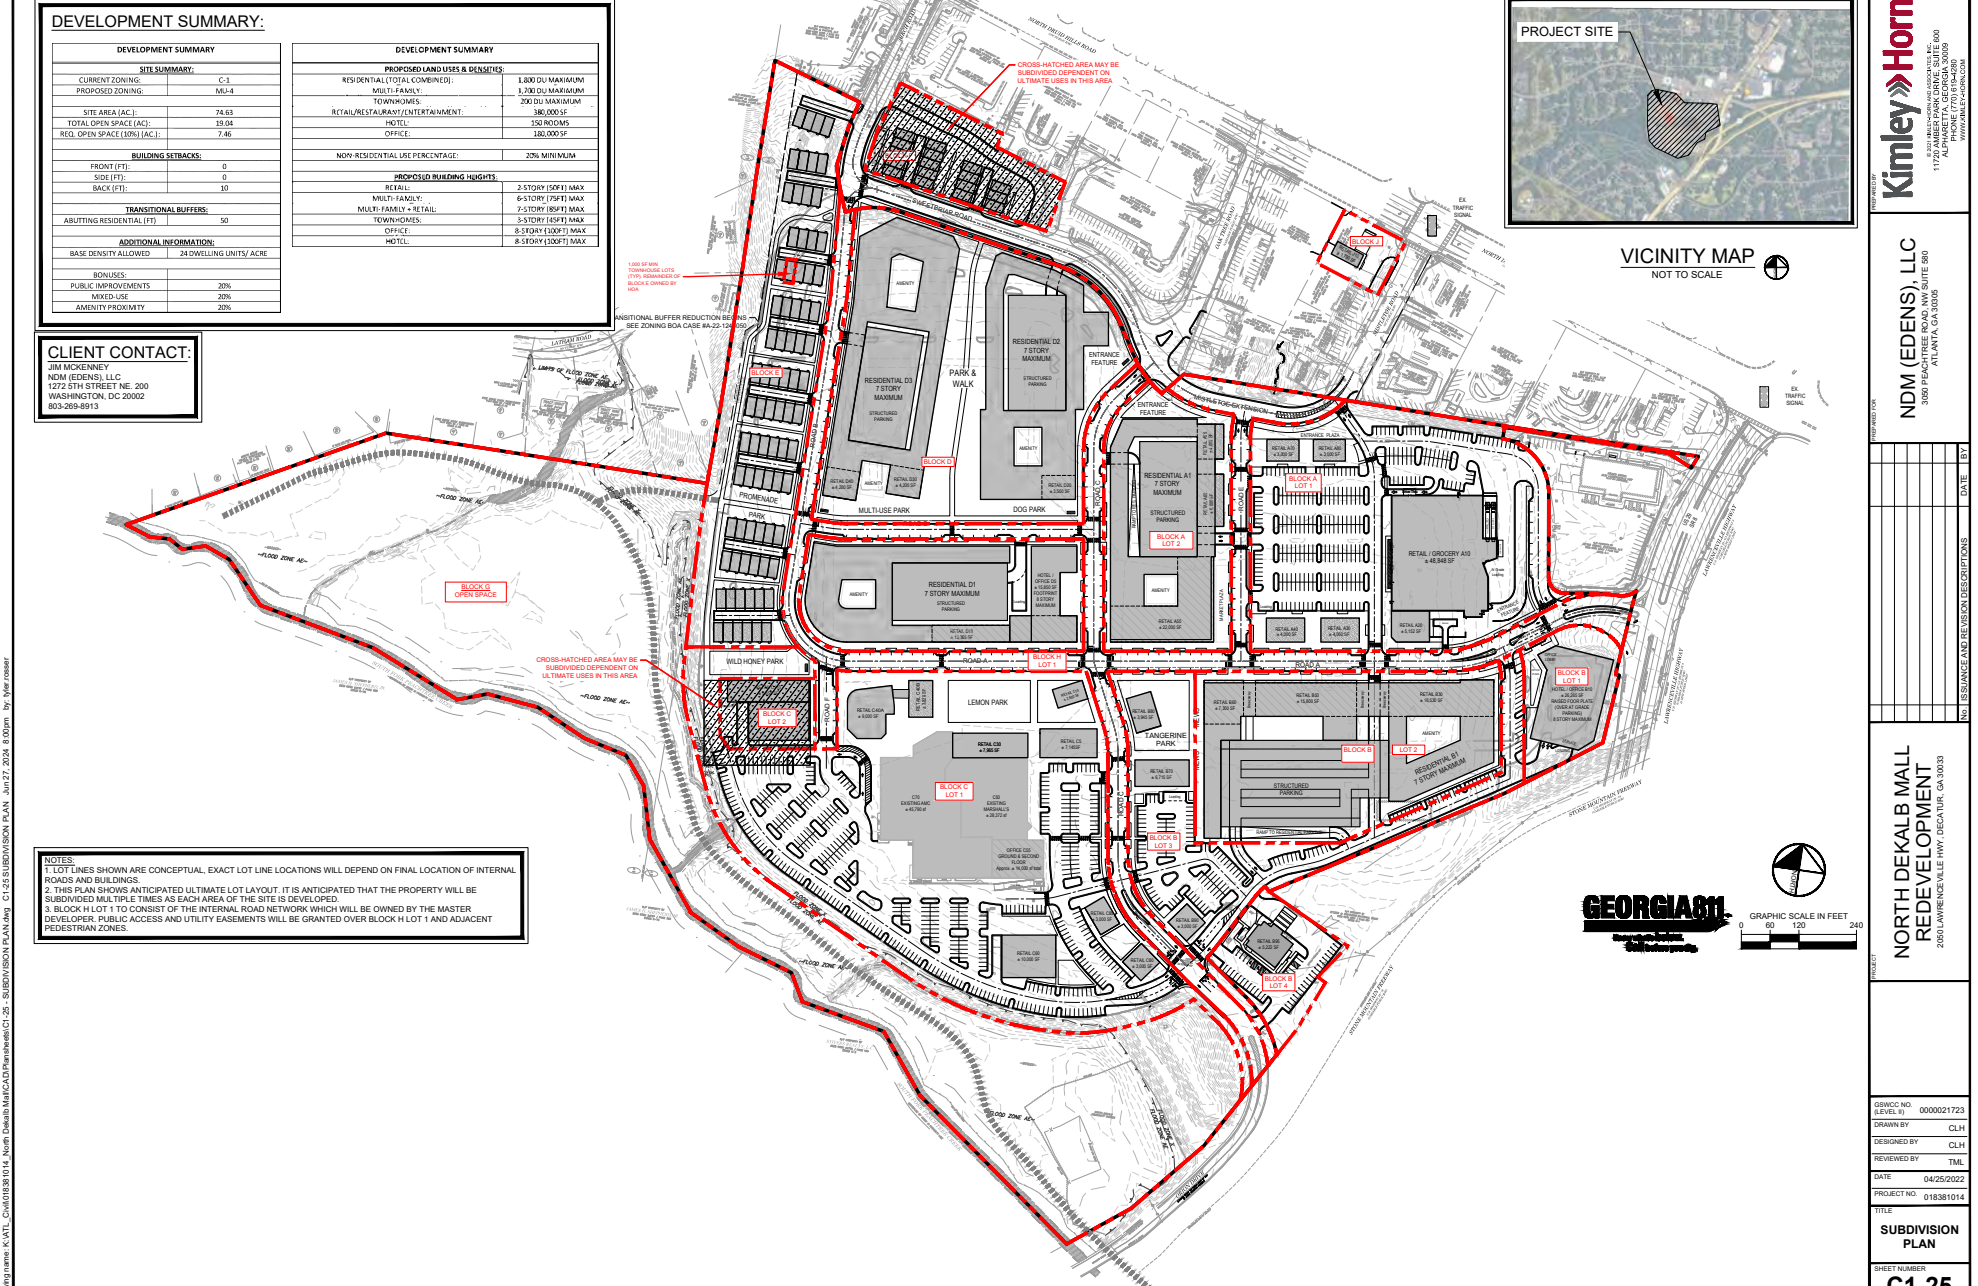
EXHIBIT C - CONCEPT SUBDIVISION PLAN
